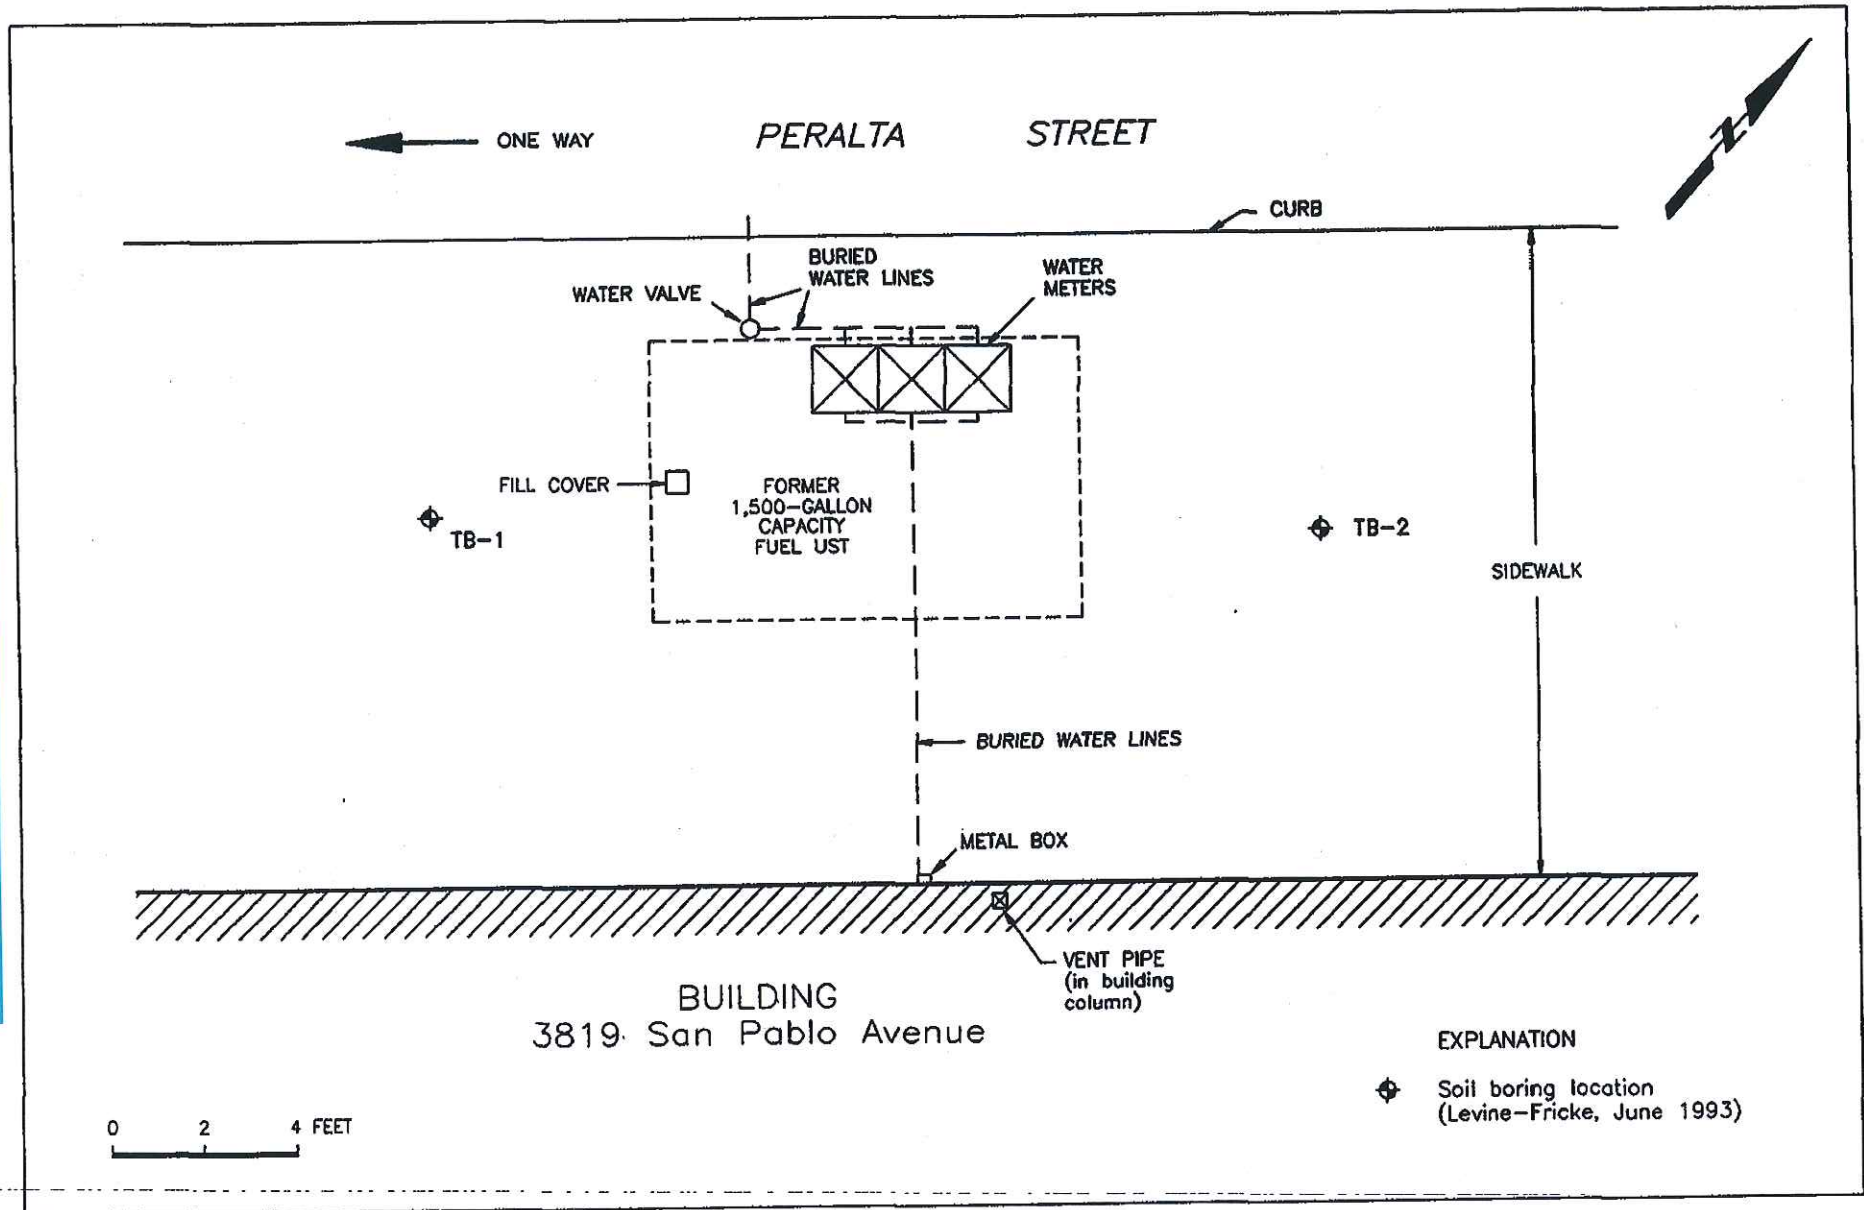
SITE PLAN SHOWING APPROXIMATE LOCATION OF THE FORMER UST AND SOIL BORING LOCATIONS
